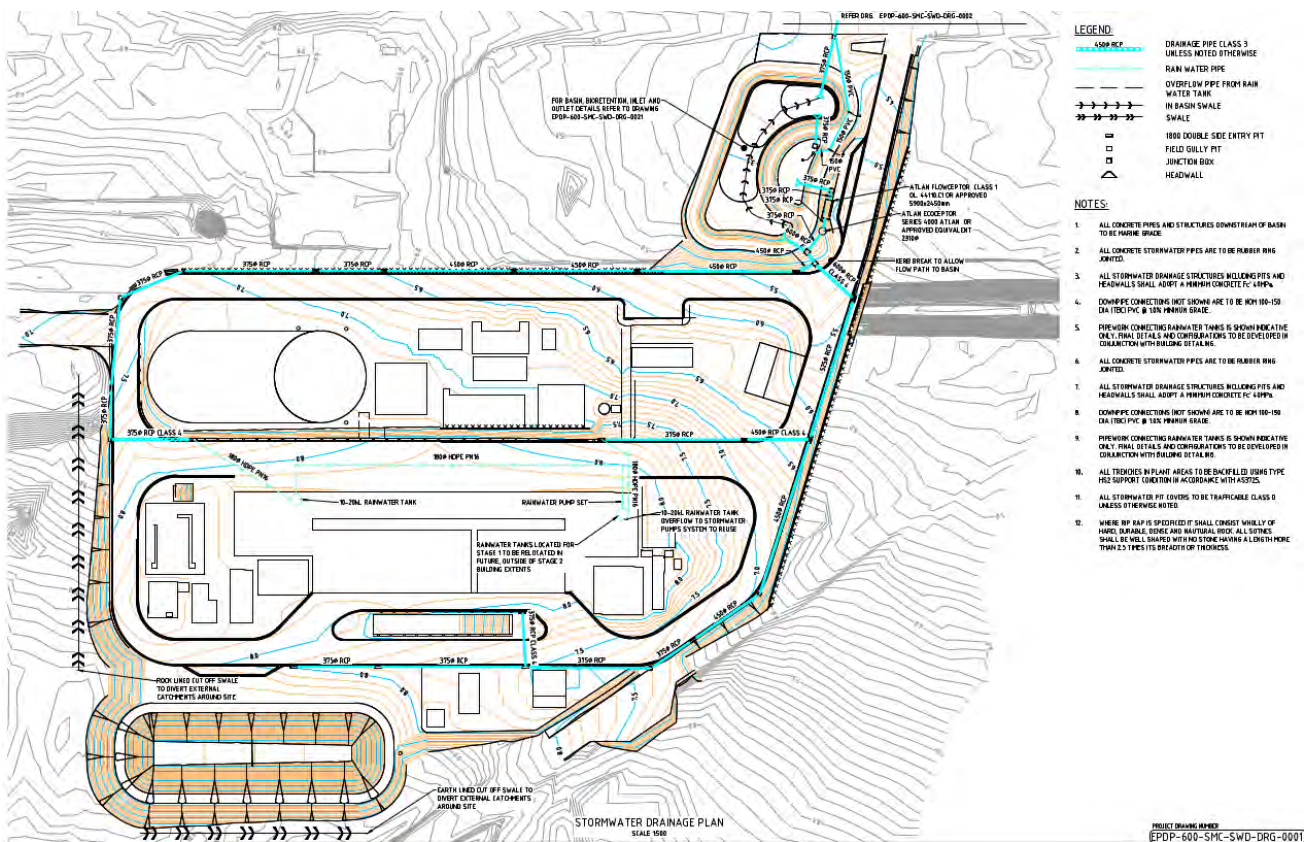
Stormwater management plan sheet 1 Concept design (EDPD-600-SMC-SWD-DRG-0001)
